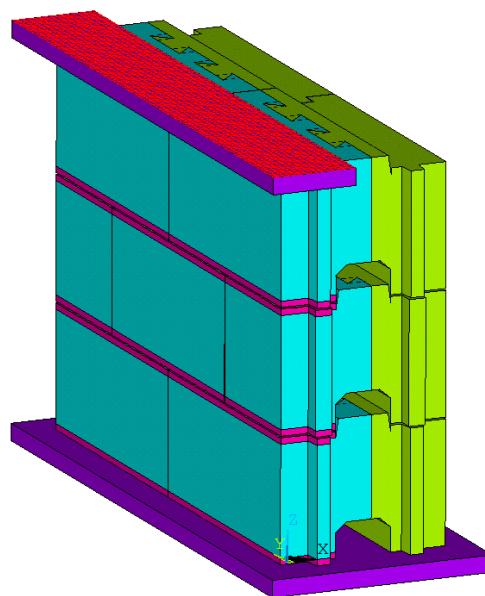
Numerical dry-stacked wall using the masonry blocks with a bearing and an insulation part
